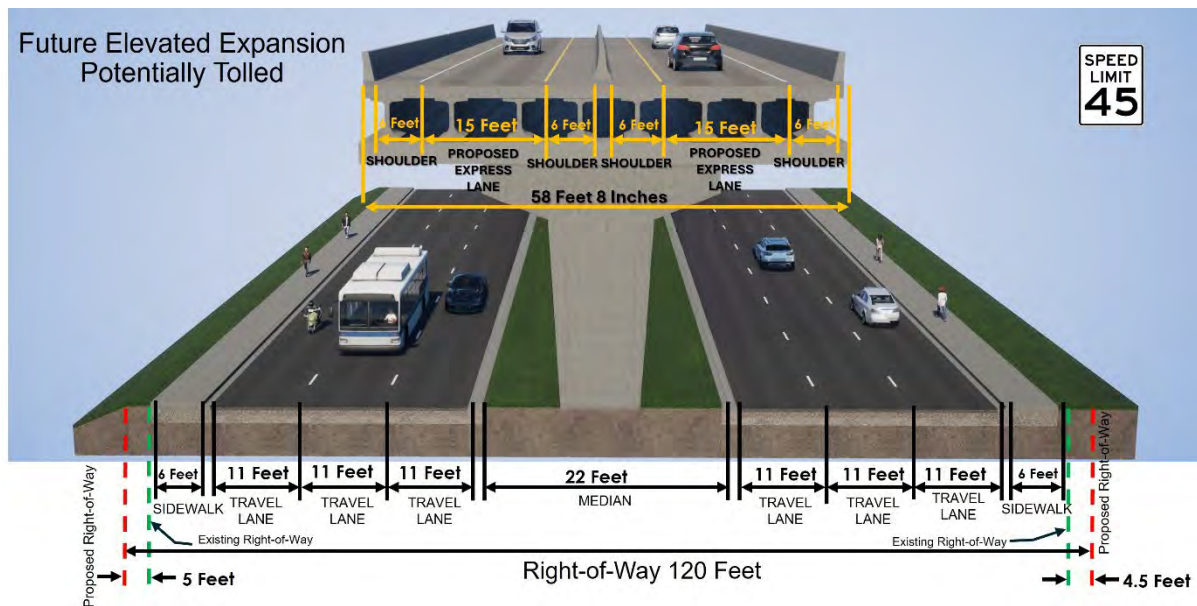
Preferred Roadway Typical Section: South of DeSoto Bridge
